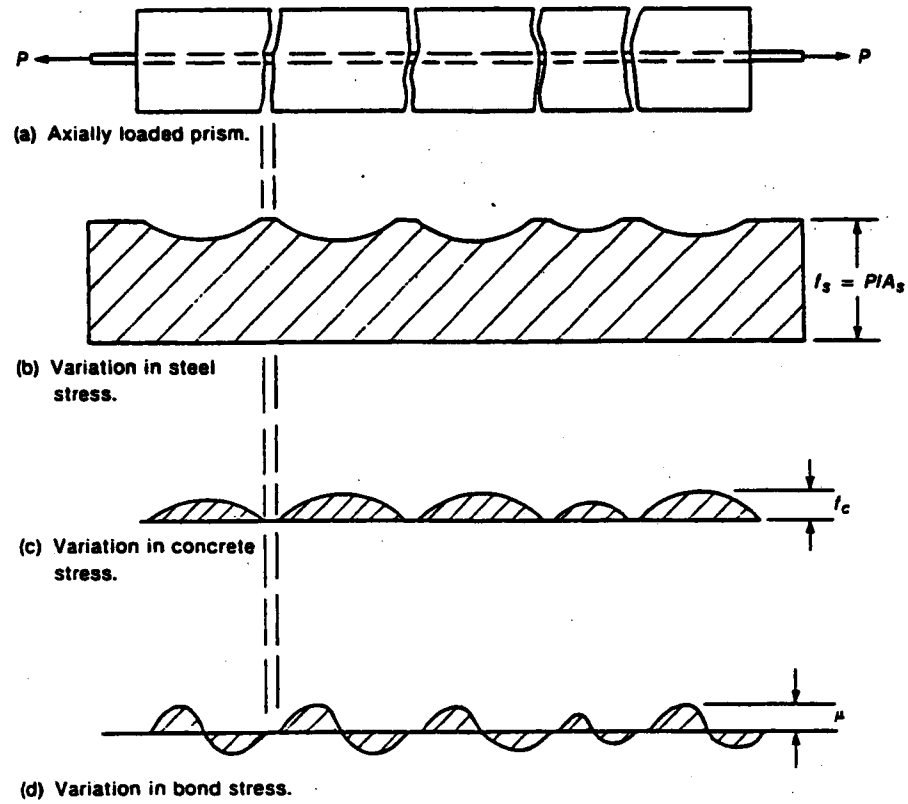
Steel, concrete, and bond stress in a cracked prism (after MacGregor, 1988)
